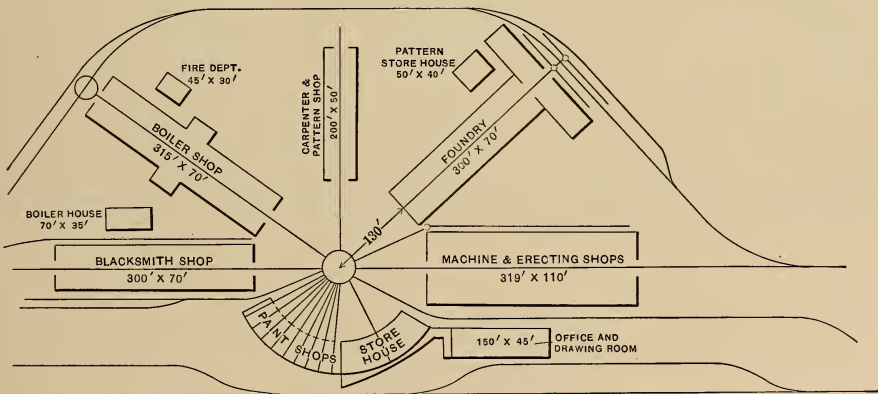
PROPOSED PLAN FOR THE WEST SHORE R. R. REPAIR SHOPS AT FRANKFORT, N. Y.
